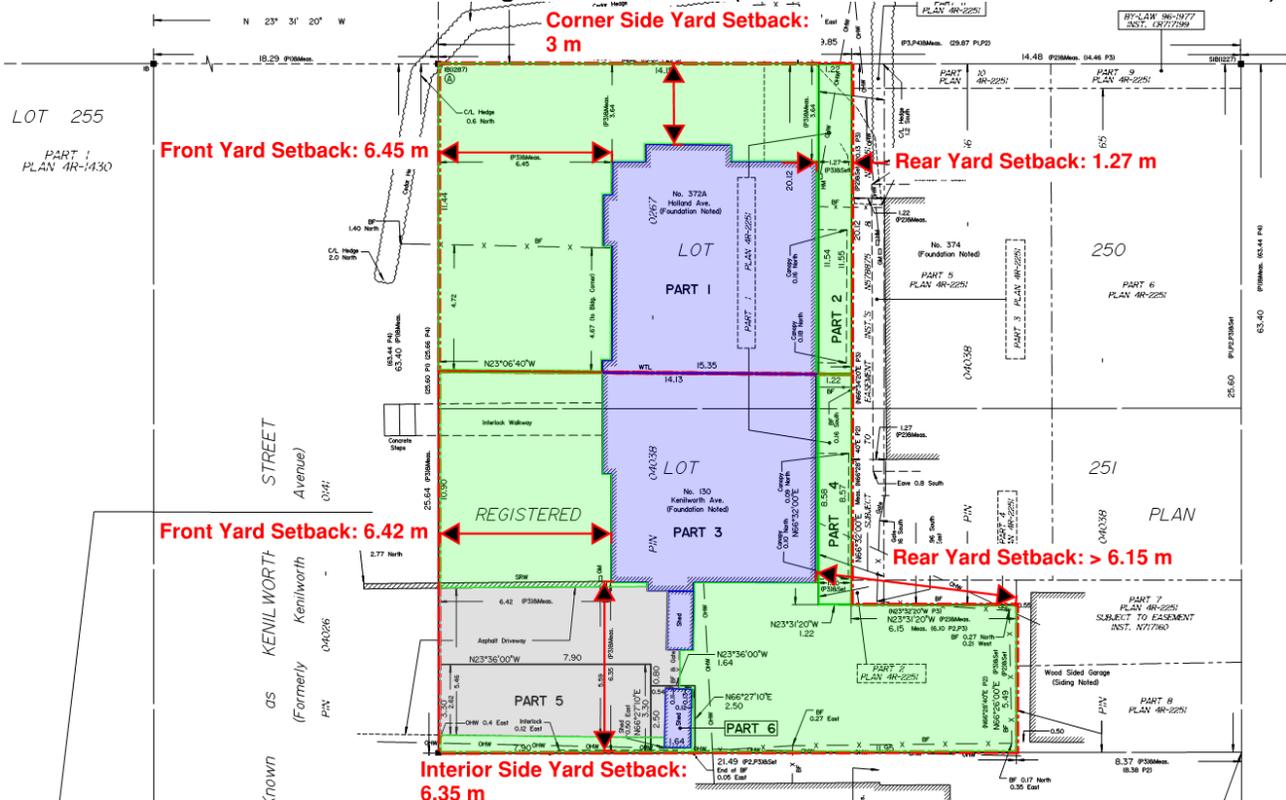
Site Plan. (Source: Annis, O'Sullivan, Vollebakk Ltd.).
